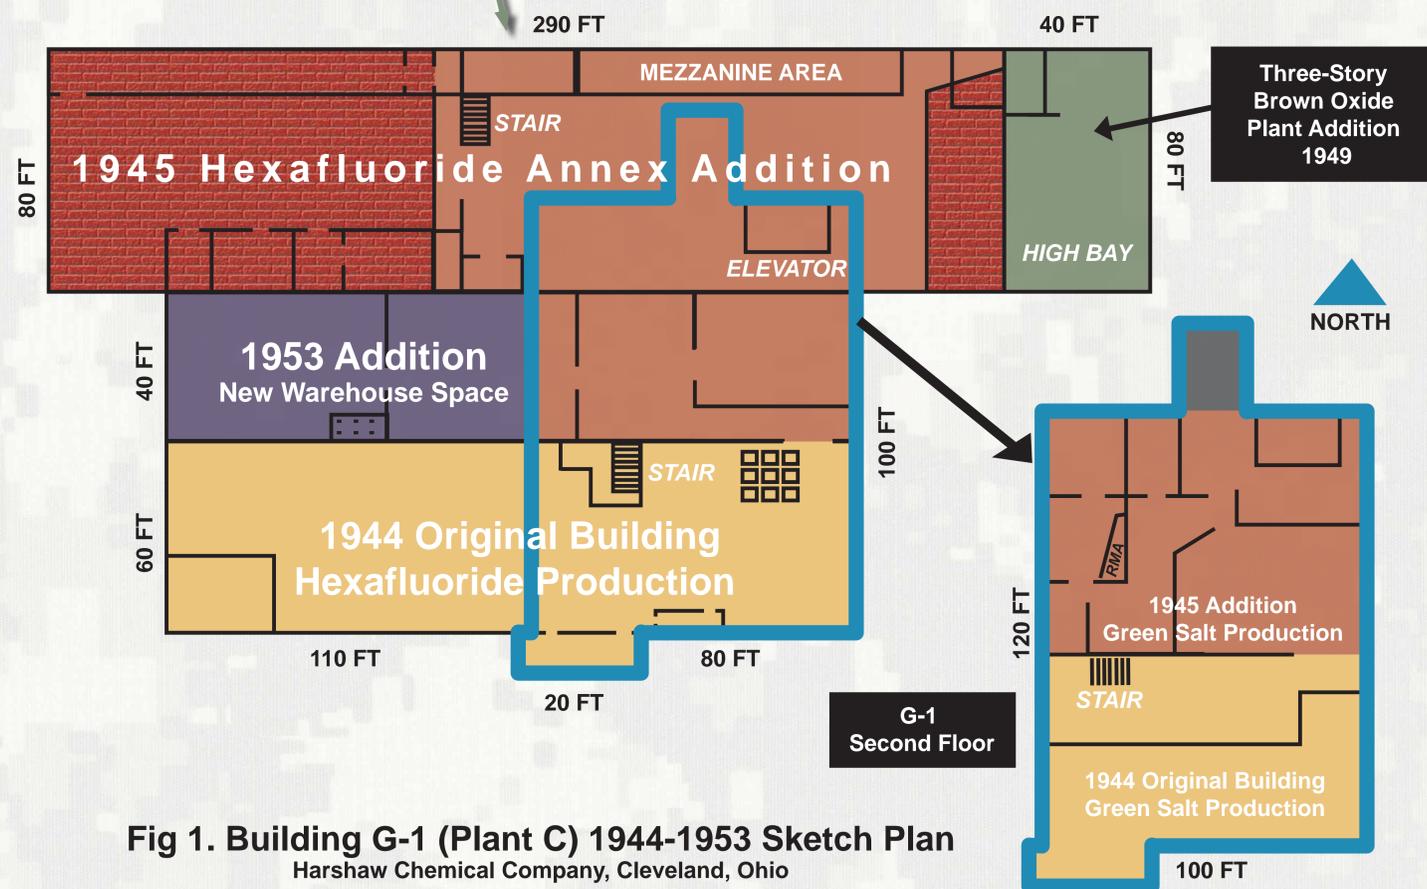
Building G-1 (Plant C) 1944-1953 Sketch Plan
